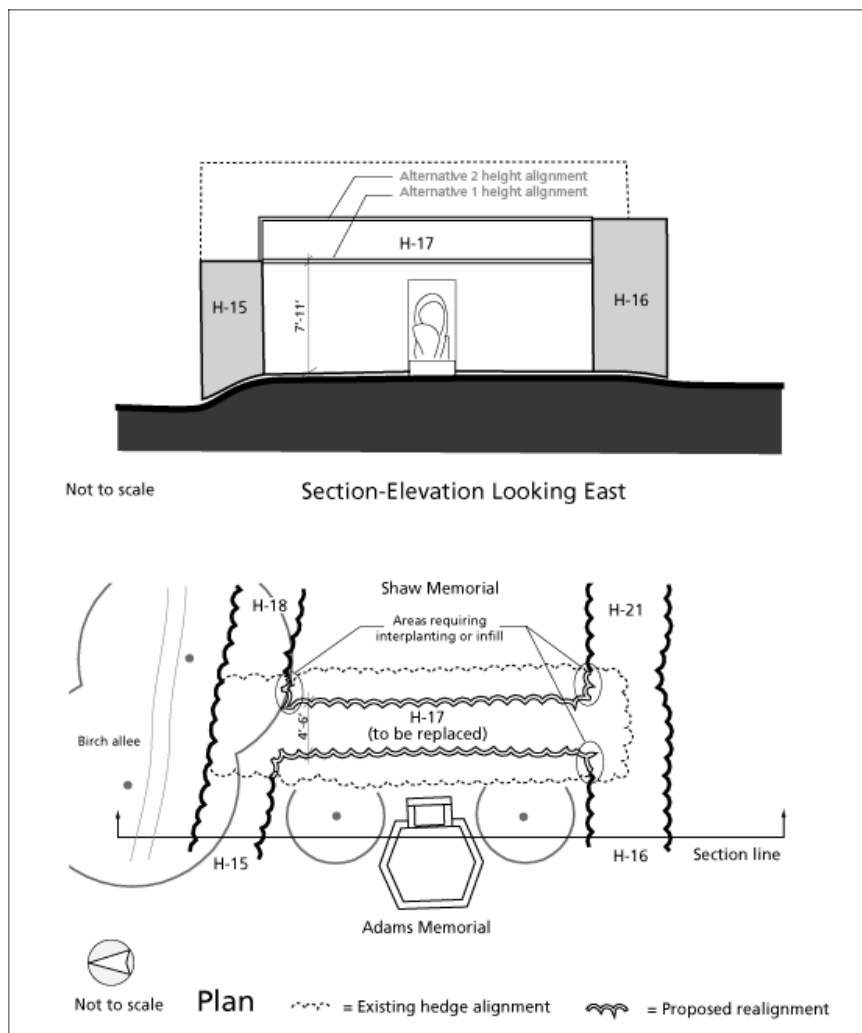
Plan and section-elevation detail of H-17 and adjoining sections in the Adams and Shaw hedges showing proportional relationships (SUNY ESF).
